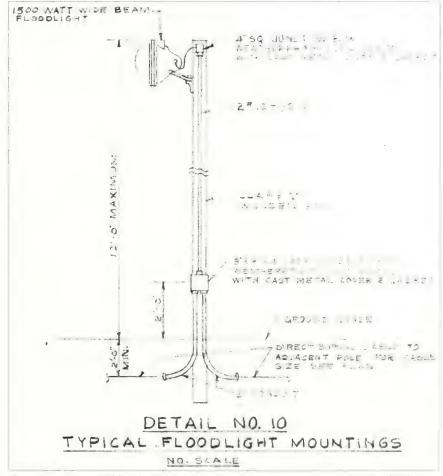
Detail of floodlight, Launching Area Plan, Electrical, 1958. Designed to be armed with a nuclear warhead, the Hercules missiles necessitated security improvements at the launch site. A component of the improvements added new 1,500 watt floodlight fixtures mounted on twelve foot-tall wood poles (GATE 11056).
